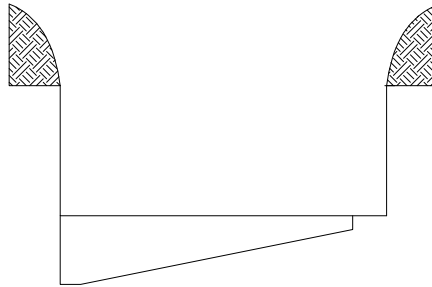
OBSERVATION AND SAMPLING PORT PREPARATION PLAN VIEW
